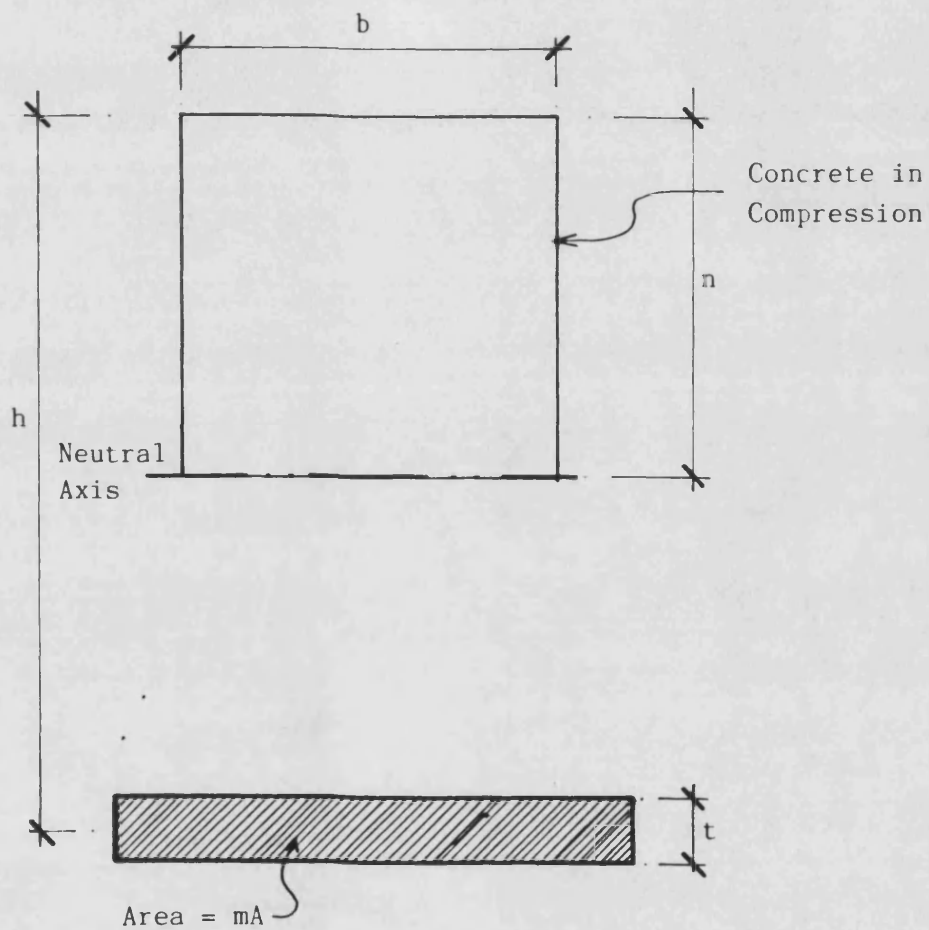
Transformed Beam Section After Concrete Tensile Failure.
